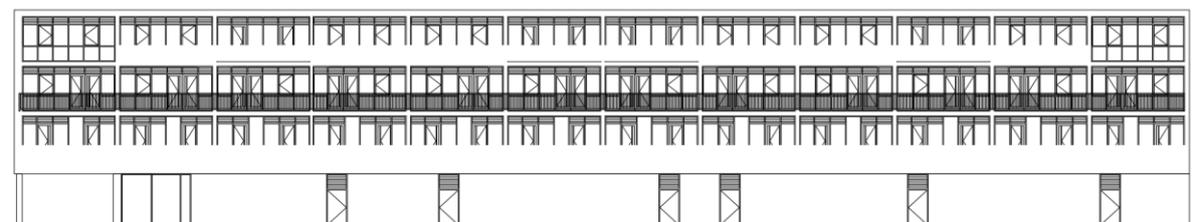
Section b-b, Building A5, Reigersbos, Amsterdam (Source: TUDELFT)
